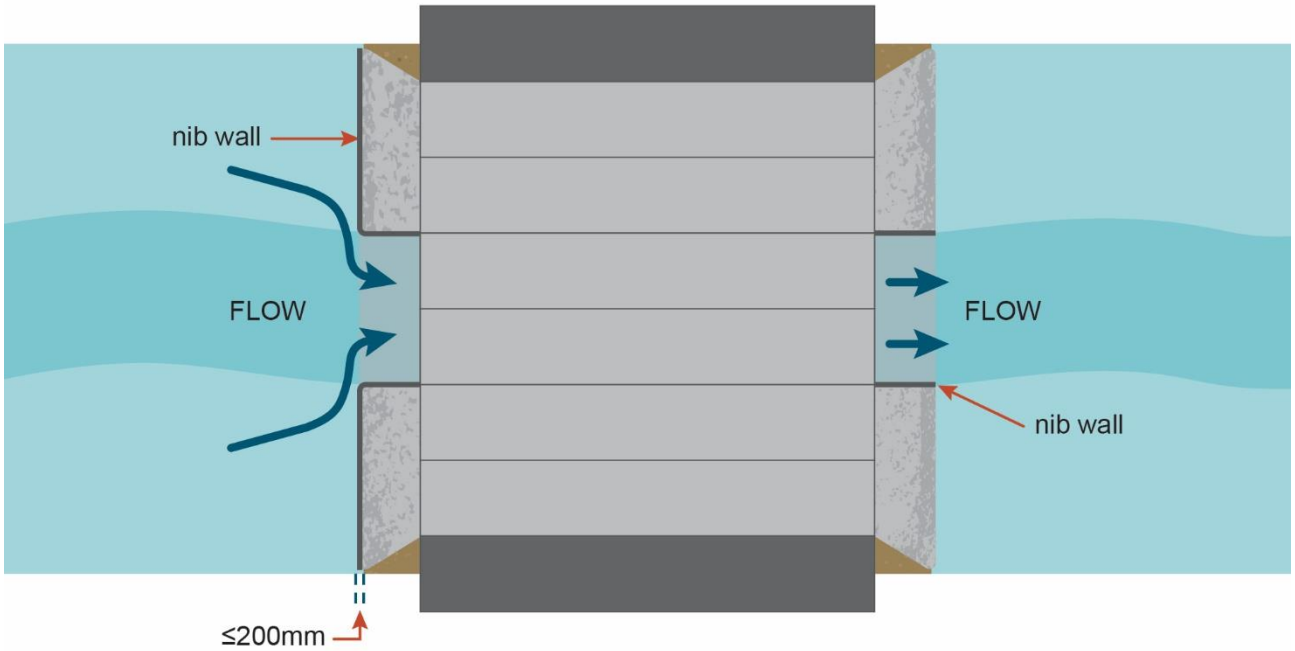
Interim nib walls on existing culvert crossing (plan view) – tidal (grey), purple, red, amber and green waterways
